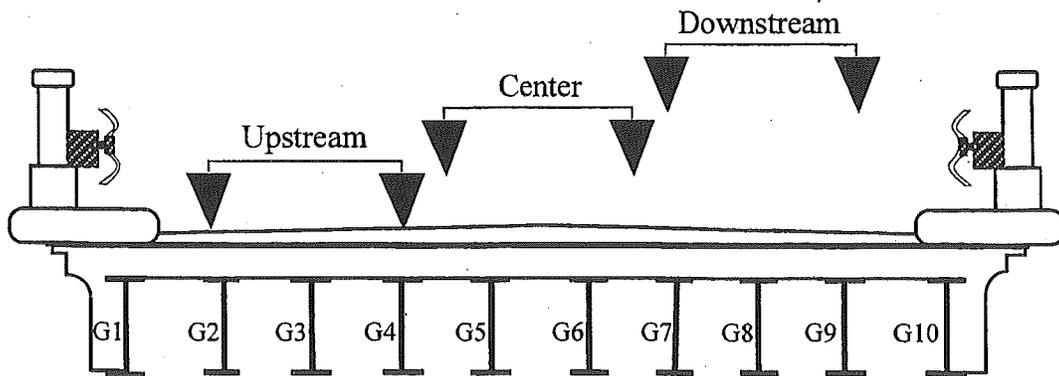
Transverse Load Positions for Bridge No. 2 (others were similar).
